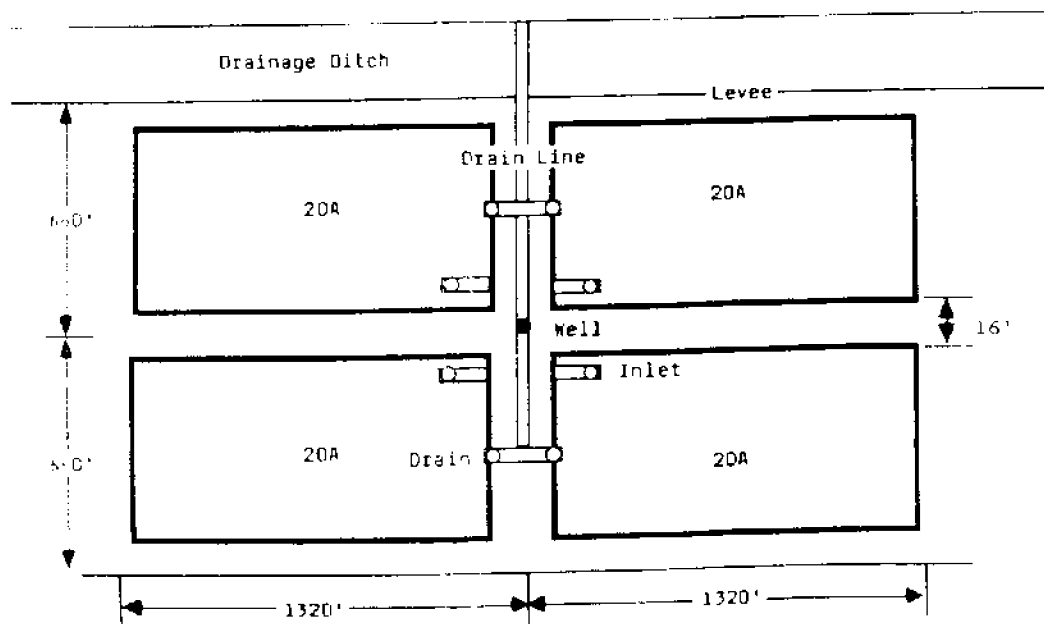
Typical catfish pond layout. Wellborn, 1989.
